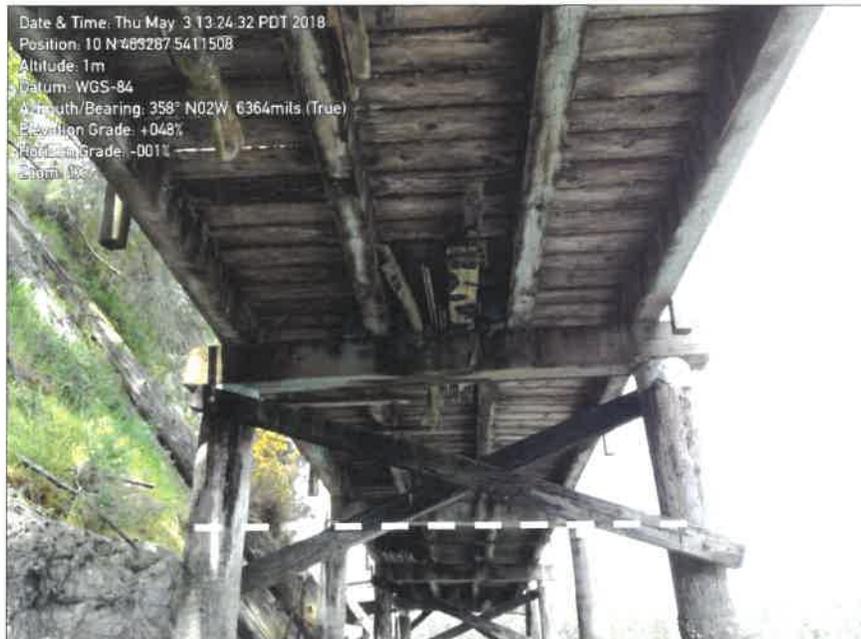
Steep native rock bank at north end of Segment 3 viewed north toward existing boardwalk in Segment 4 during a ~0.3 m tide. 3-May-2018
